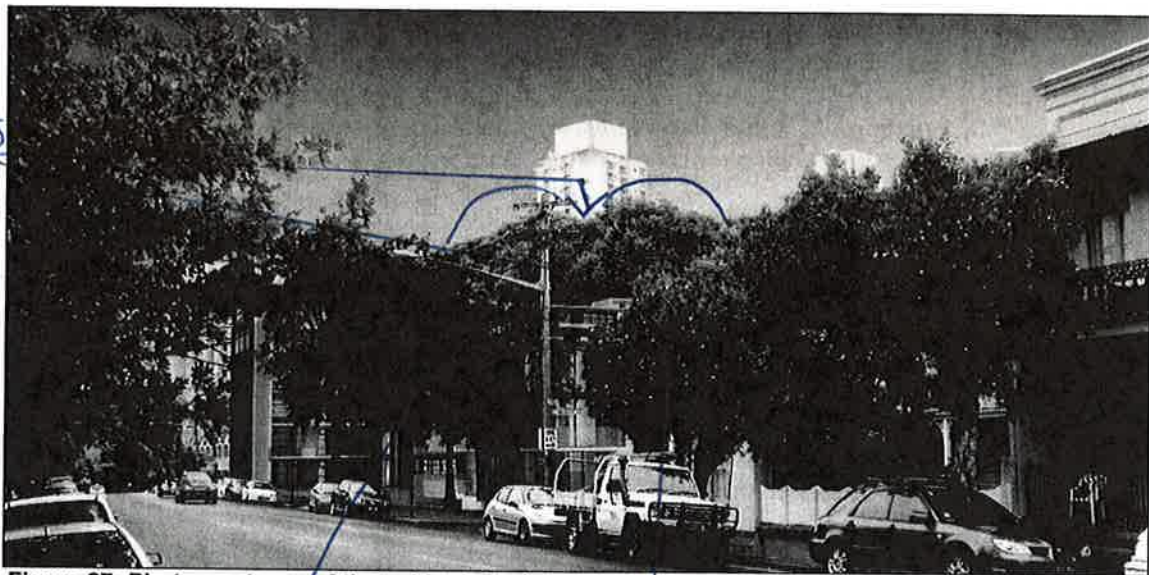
Photomontages of the subject site (as viewed from corner of Pitt Street and Albert Street)
